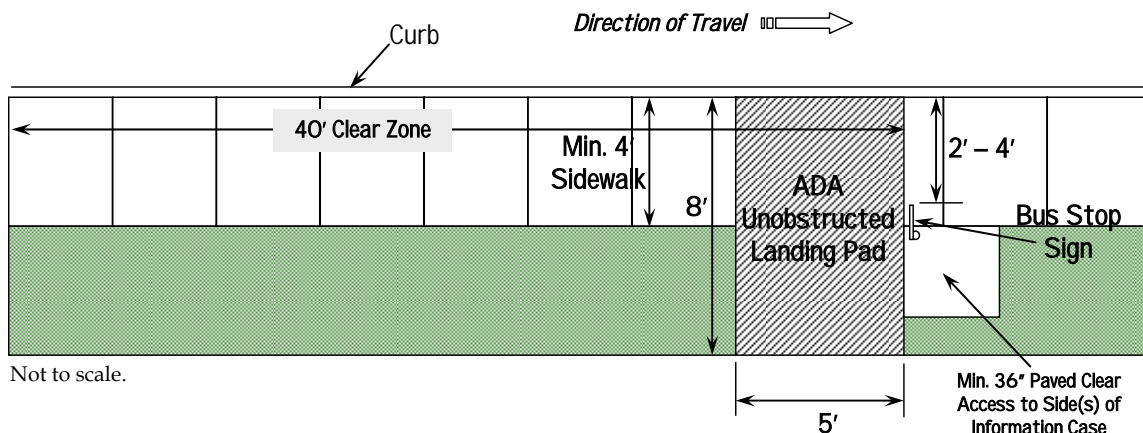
Basic Stop with Sidewalk Adjacent to Curb
